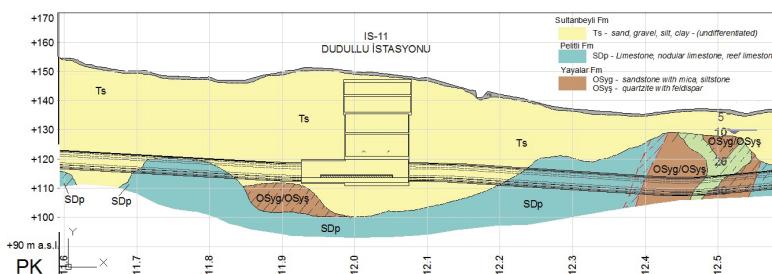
Geological longitudinal section for Section B, black lines indicates the tunnel alignment and Dudullu station layout.
